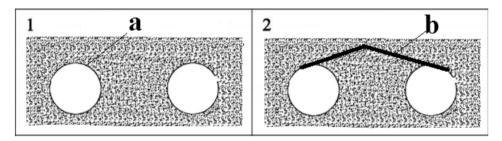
Construction stages of CPPS (a: TBM lining; b: piles)
